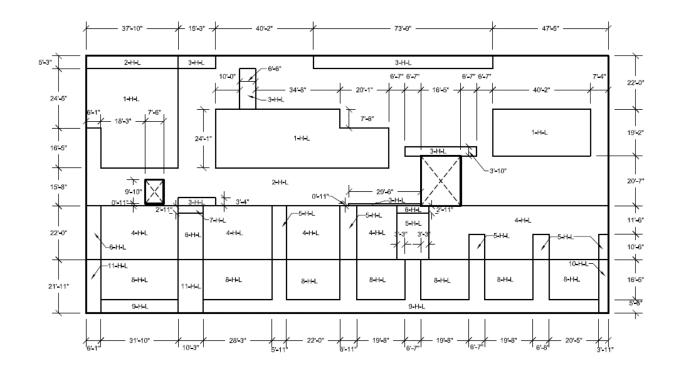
H.3-8 North Wall Looking South Horizontal Reinforcement Zones Near Side Face
